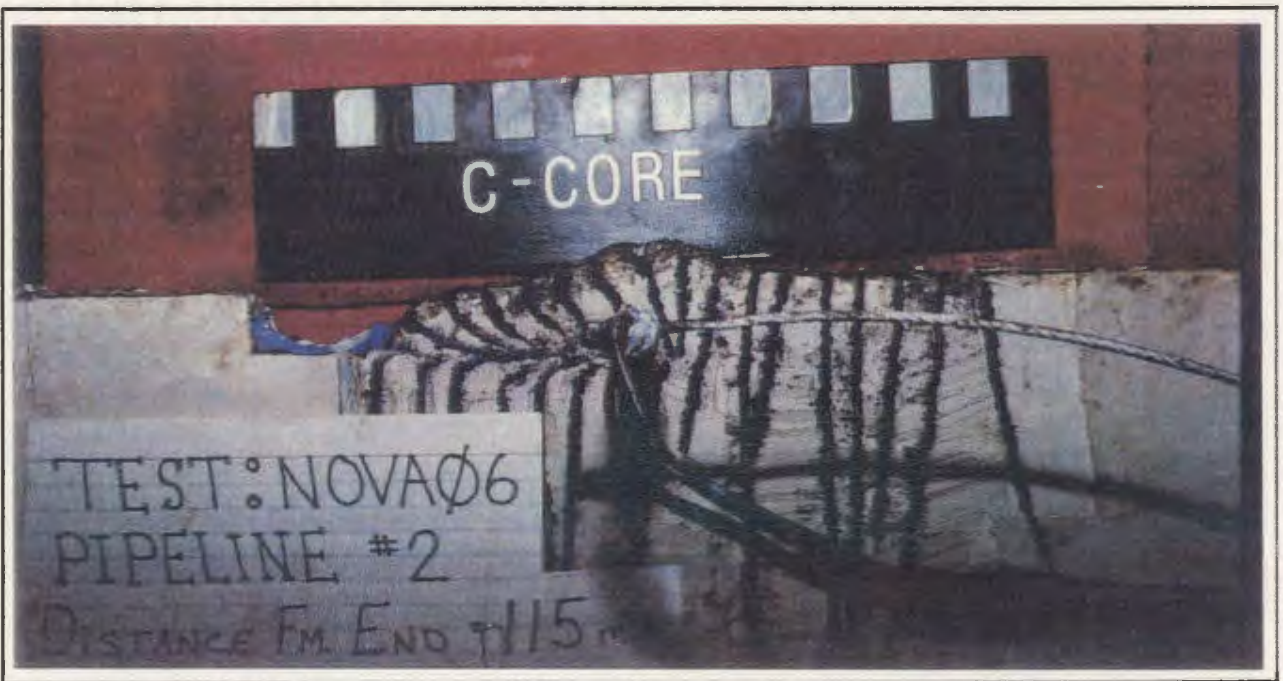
Photo of excavated cross-section along mid length of model pipeline #2, 5mm cover, Test 06.
